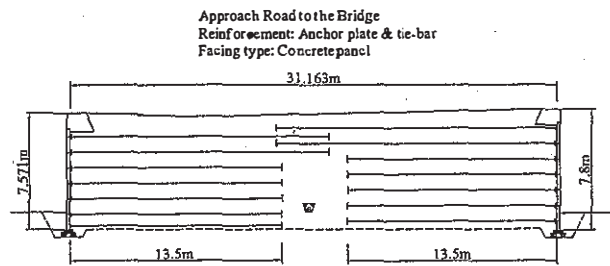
The Multi-Anchored reinforced wall currently used for approach road to the bridge
